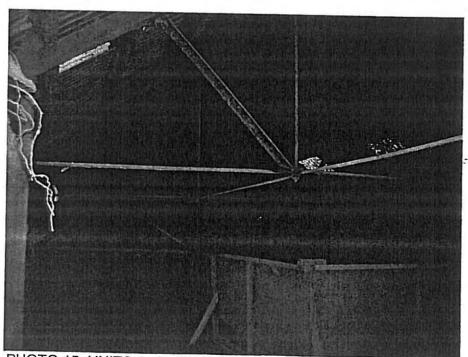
UNITS 1-4 - FIRST FLOOR (3.05)
